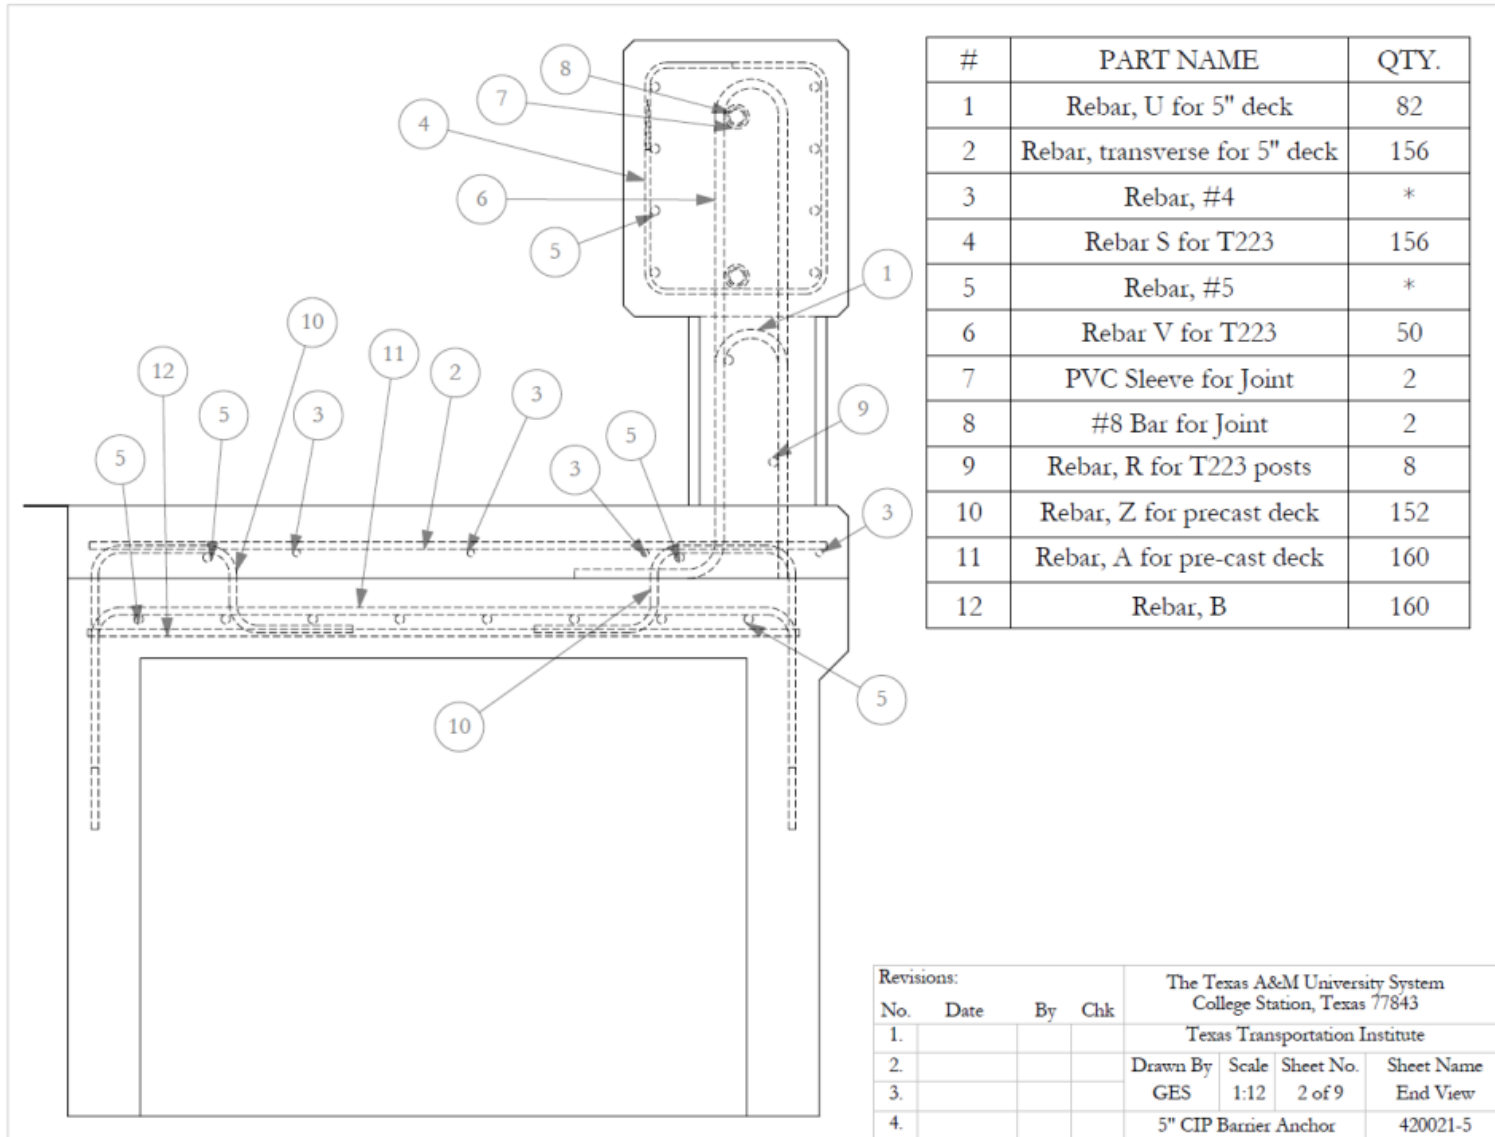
Design Drawings for T223 Concrete Beam-and-Post Bridge Rail [15]
